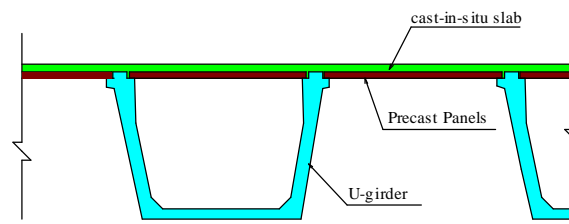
Girders and slab structures in Nasu-dukuri Viaduct
